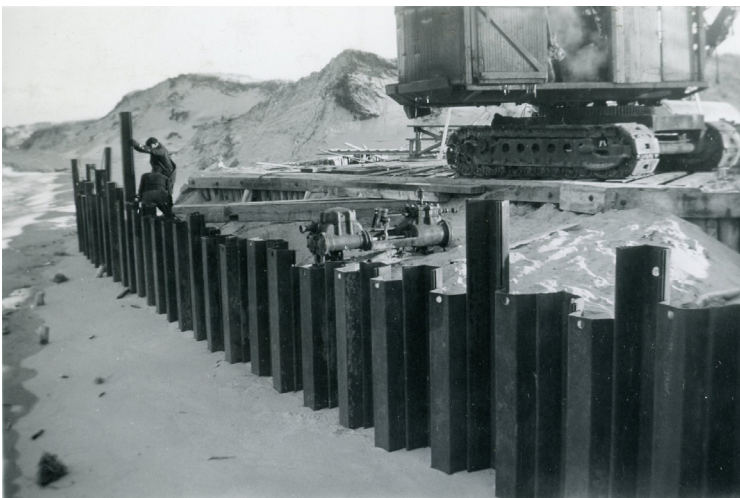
B-58: Steel sheet piling being installed in the fall of 1943 to provide shoreline protection around the fog signal tower.
